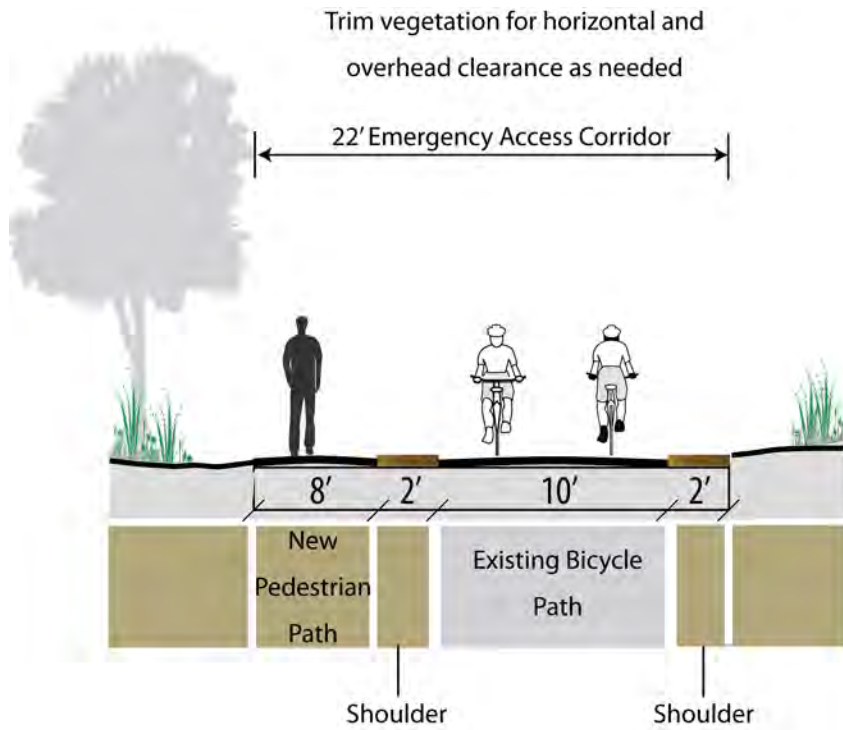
Section Through Existing Sandra Marker Path with New Pedestrian Path
